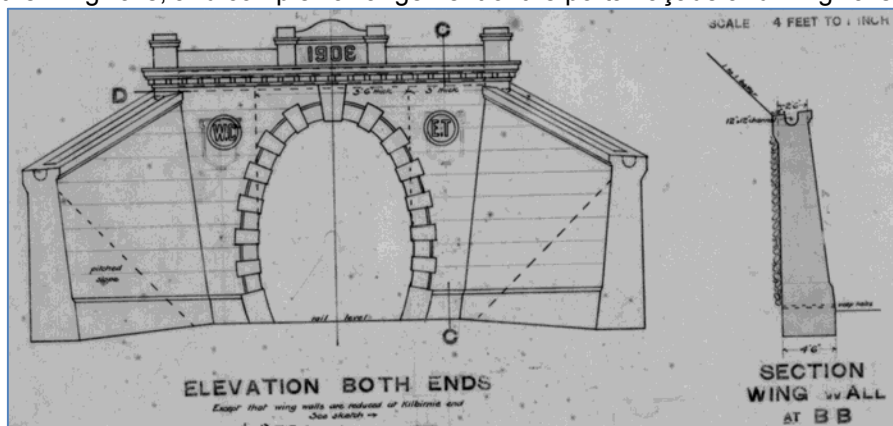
Typical Elevation and Section from historic drawings (courtesy WCC archives).
